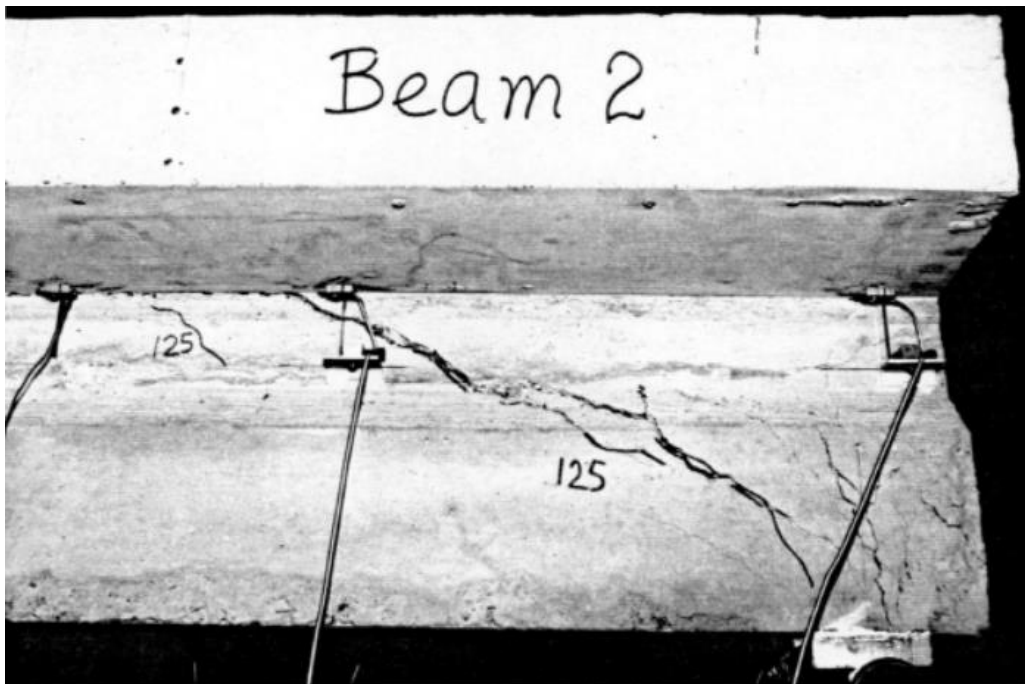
Horizontal shear failure mode for beams with full length flange.
